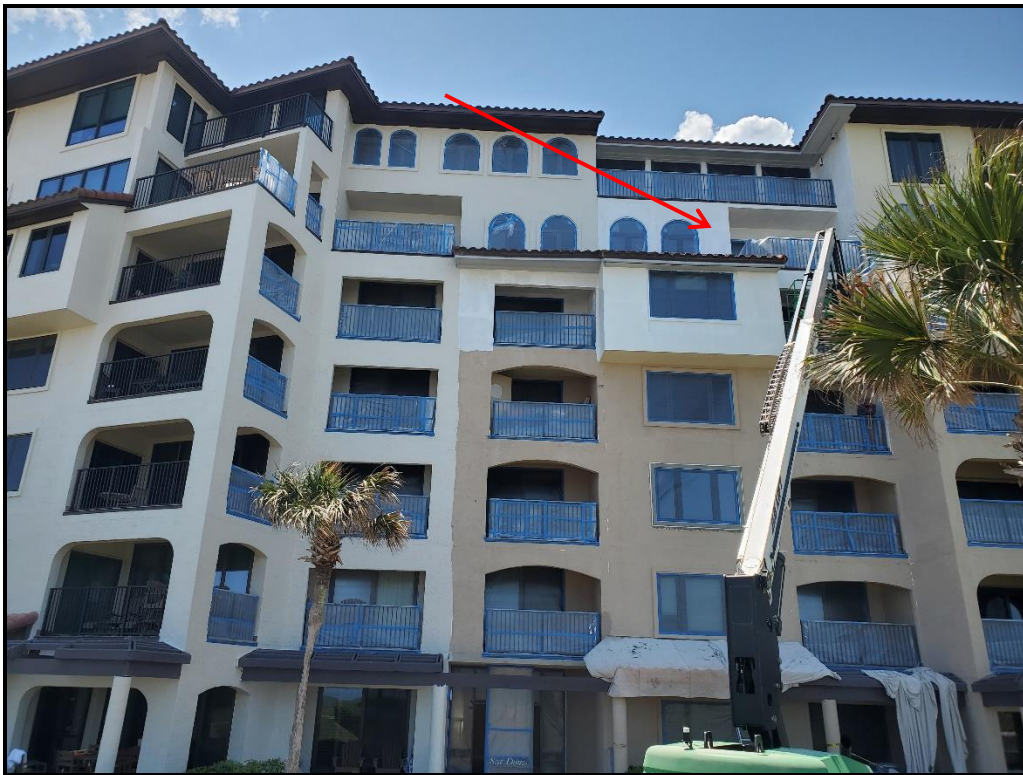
4<sup>th</sup> floor archway sheathing installation in progress.
